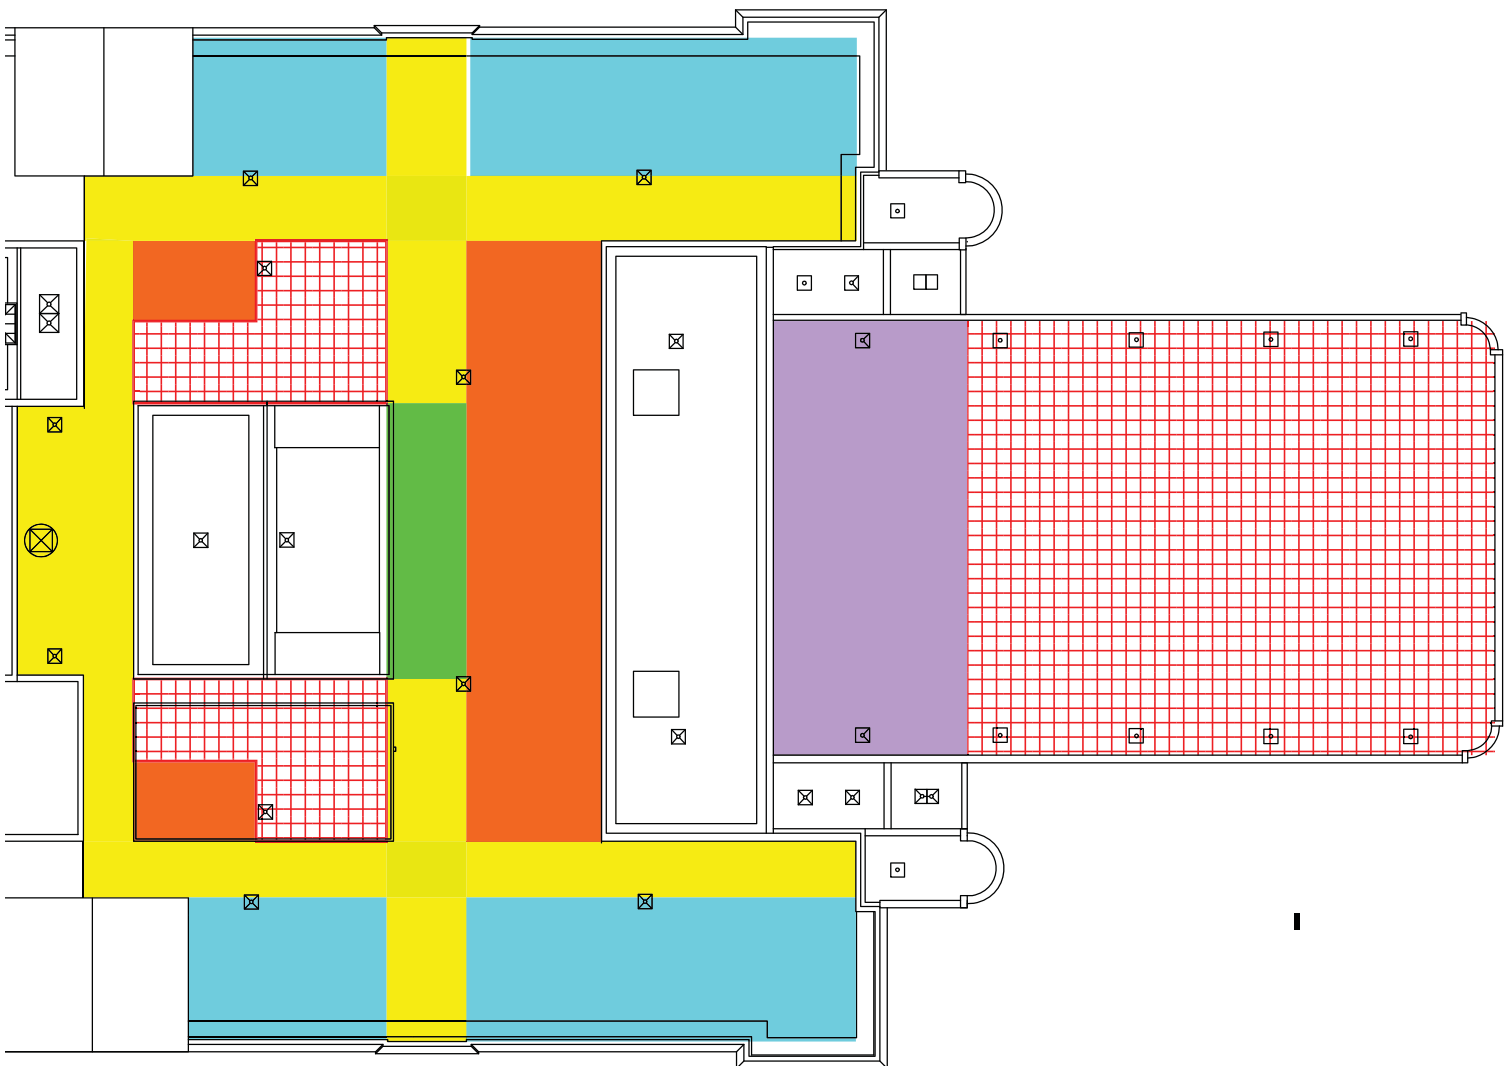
Roof Plan Showing Available Structural Capacities; scale = 1/40=1'-0"
